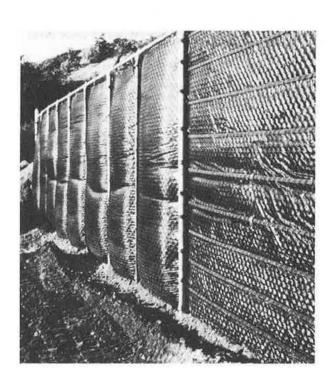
FABRIC FACING, TEST WALL NO. 3
